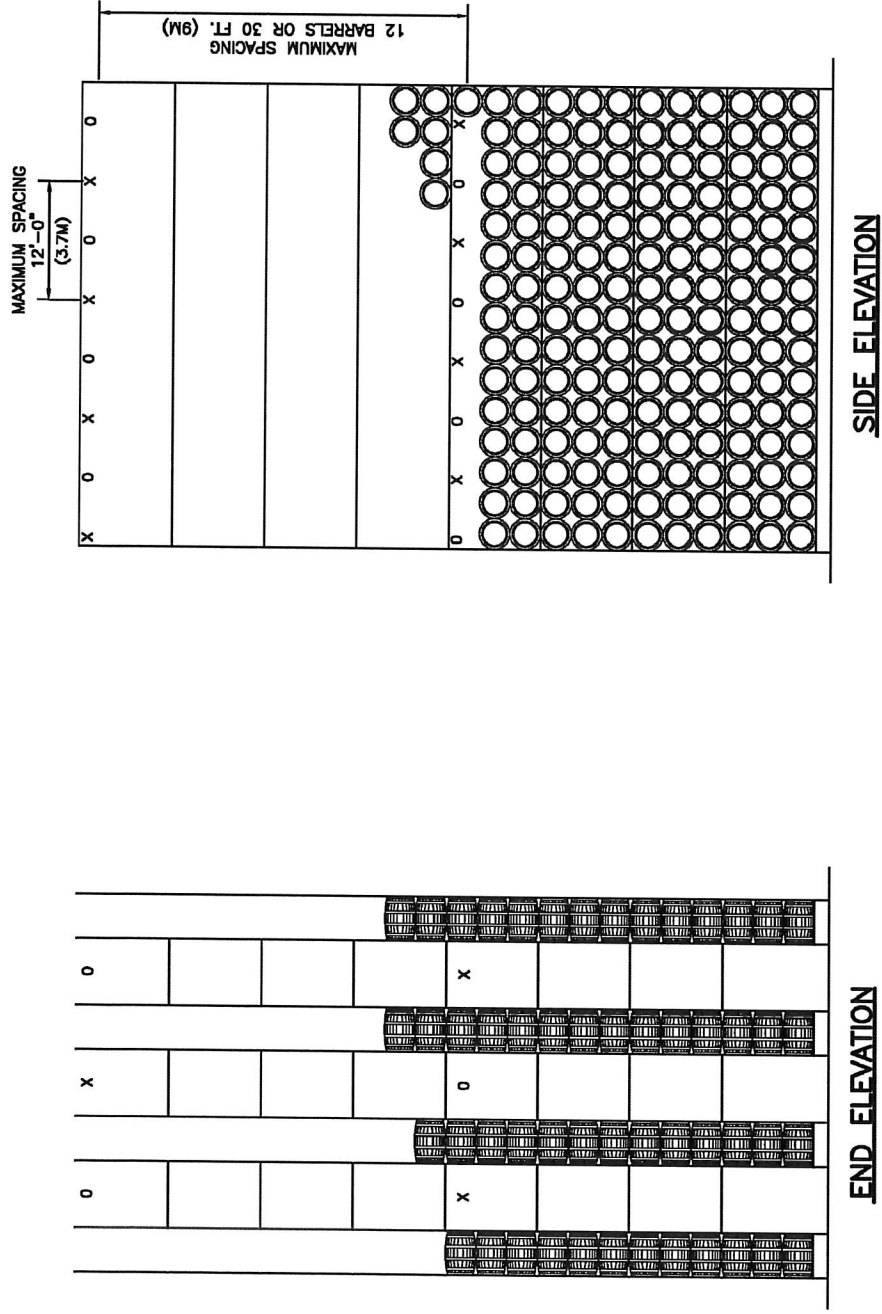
Single-Row Racks. Location of In-Rack Sprinklers
